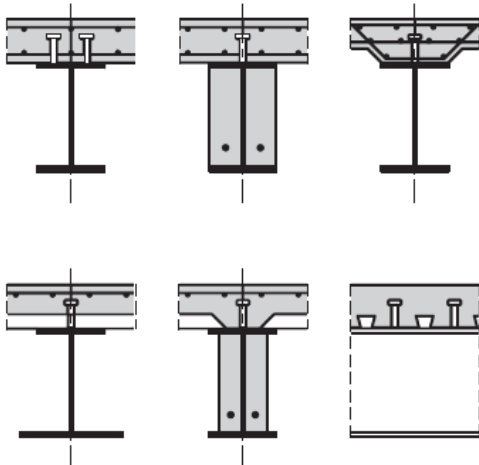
Typical steel-concrete composite beam cross-section [2].
